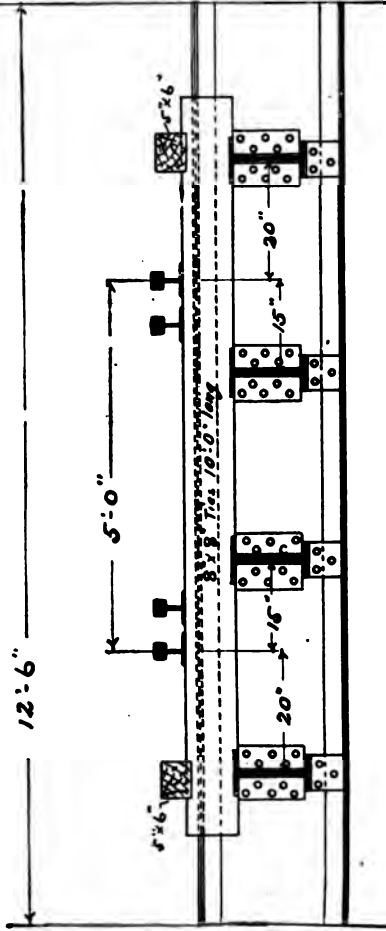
PLAN OF FLOOR FOR AN IRON TRUSS THROUGH BRIDGE, RECOMMENDED BY MR. JOHN FOREMAN, PHILADELPHIA AND READING R. R.
